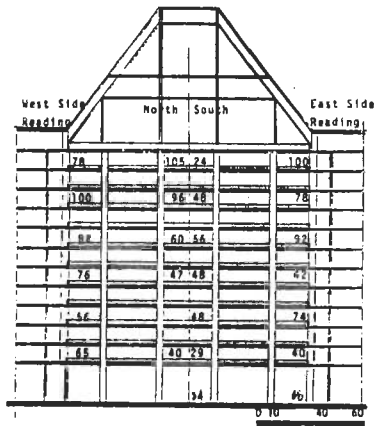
Cross-Section of Square Atrium Looking North, Showing Illuminances Normal to Walls and Floor
